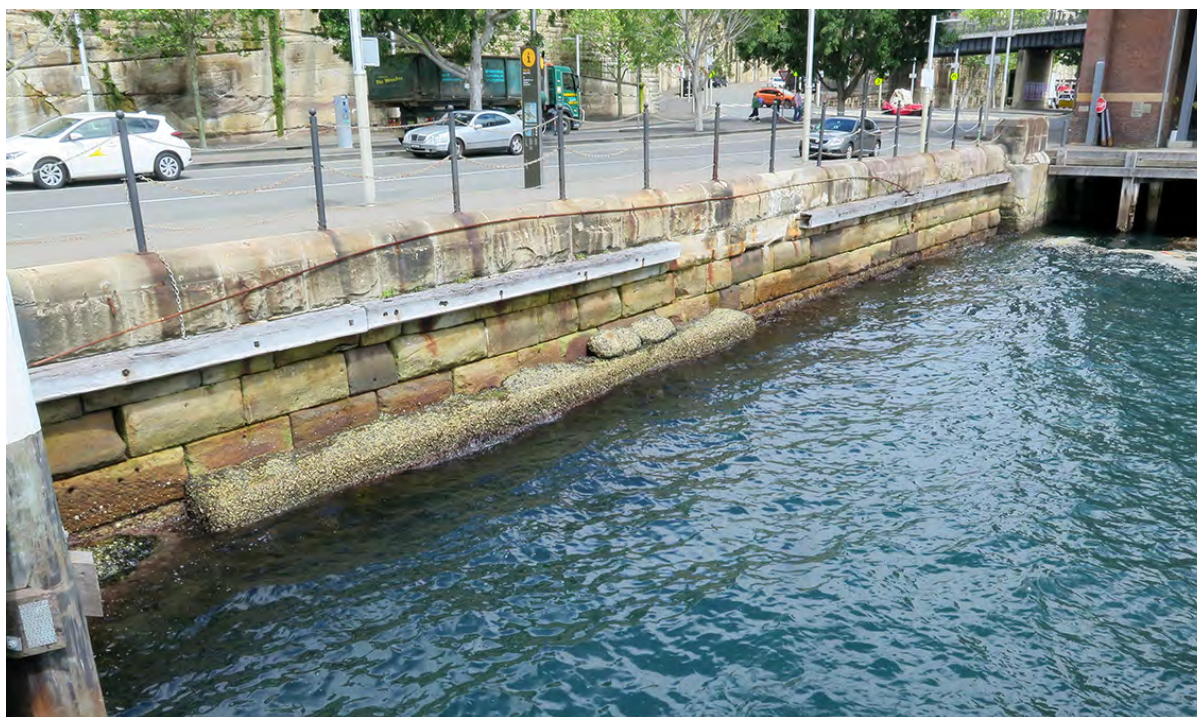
Section of sandstone sea wall to east of Pier 2/3. (Source: CRM 2016)
